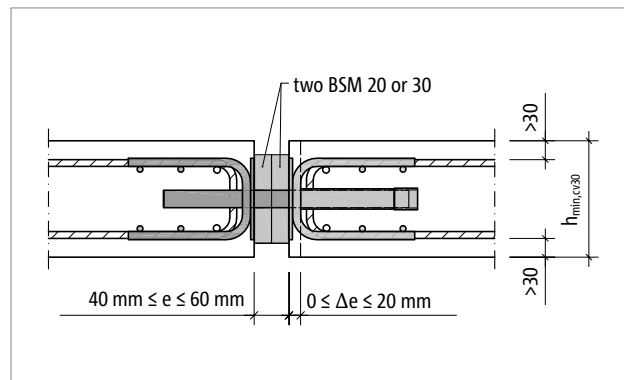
Positioning of the fire protection collar with a joint width of 40 to 60 mm and a maximum joint opening of 20 mm
